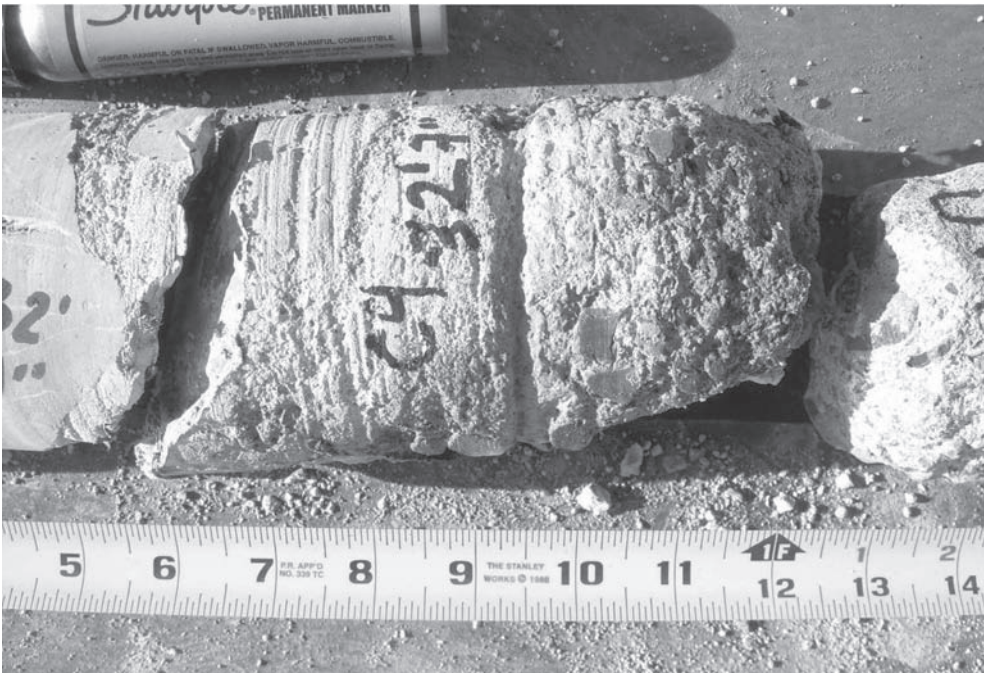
Poor quality concrete, typical of samples extracted below the tidal fluctuation zone.
